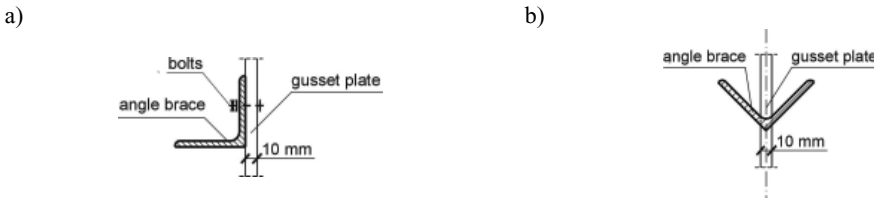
Details of angle bracing connection; a) specimens BL, b) specimens WL.
